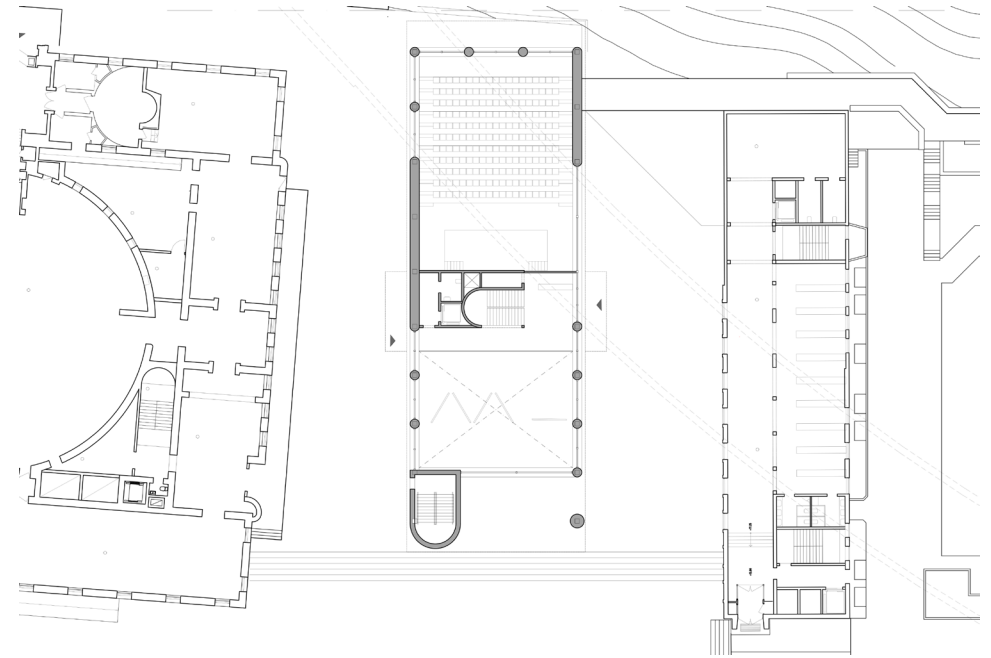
Ground floor plan of the decentralize proposal. Made by author.
